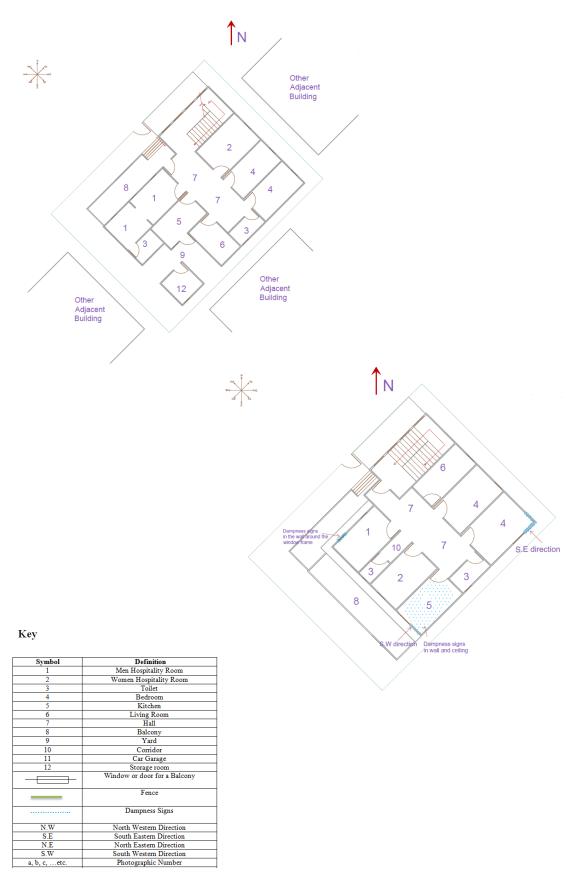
Ground floor and first floor plan of house 9, East Albeida quarter, Albeida, Green Mountain Libya
